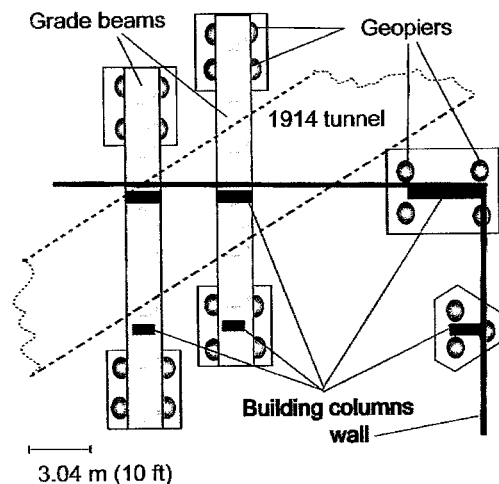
Support members and grade beams to protect an existing tunnel from anticipated foundation loads.
